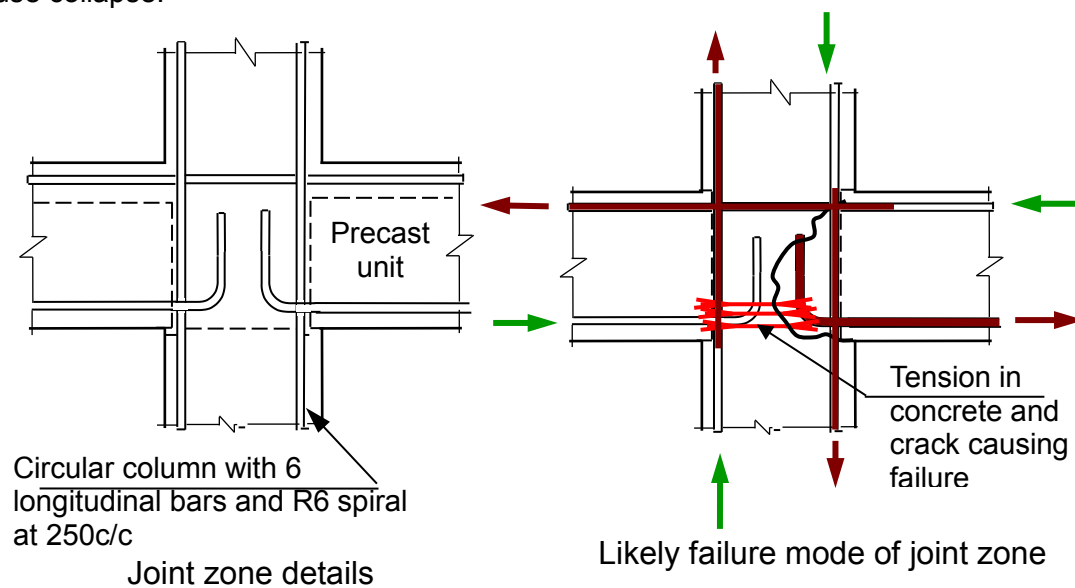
Beam column joints West wall of building (see 3 on Figure 23)
